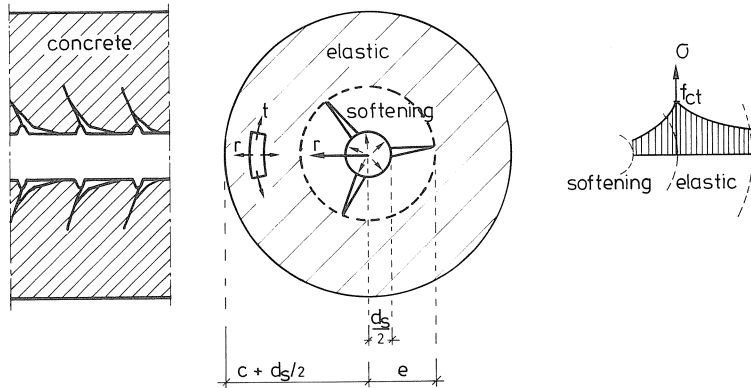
Concrete ring with internal cracks surrounding a reinforcing bar.
